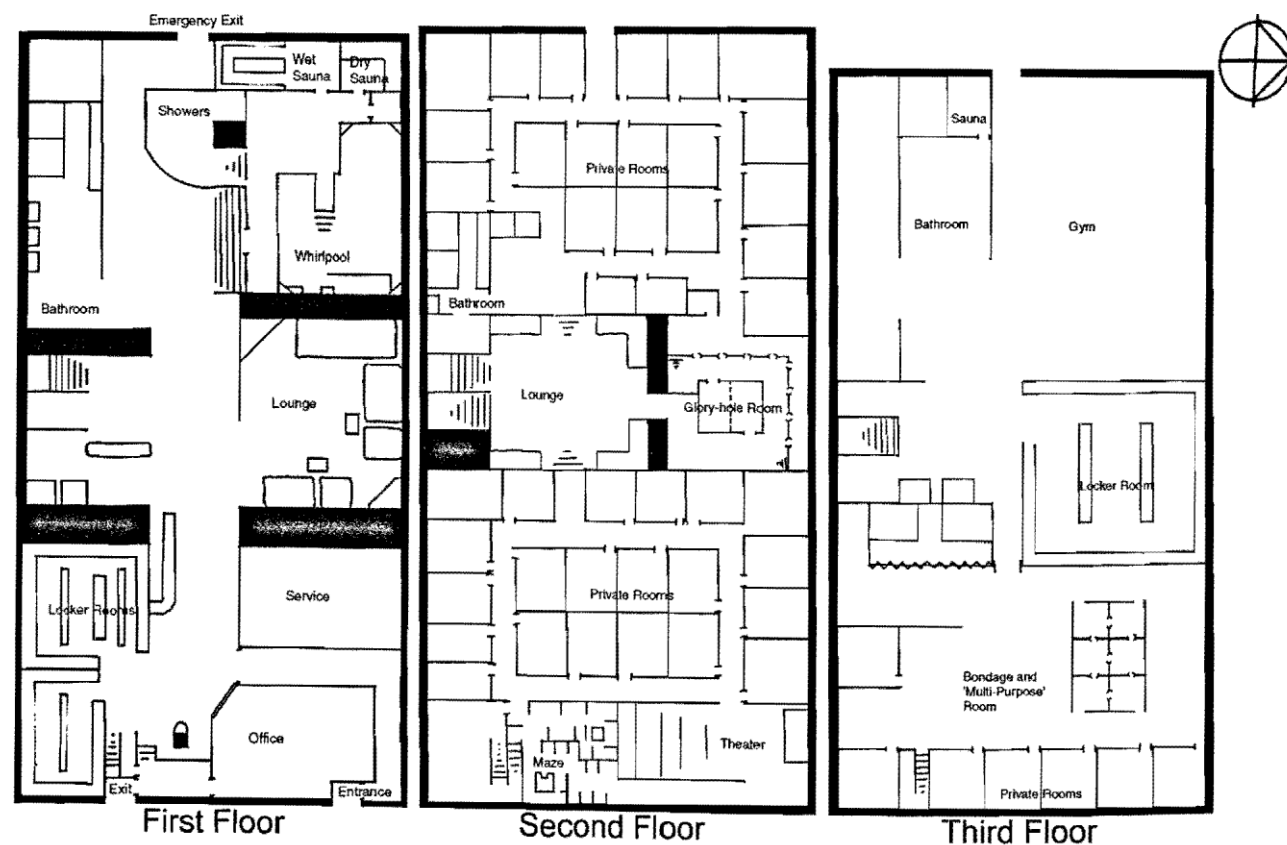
Plan of Steamworks, Chicago (rough sketch by the author).
